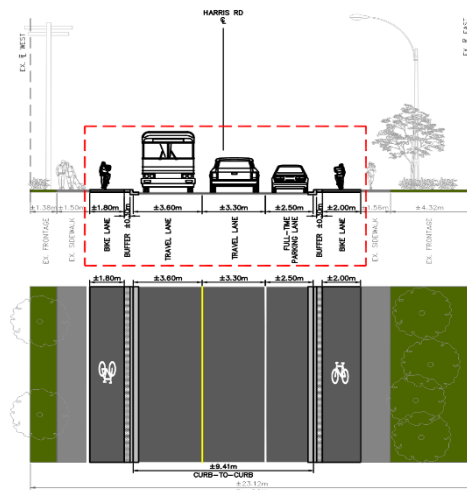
Segment 3: Option 1 Retrofit Cross-Section
